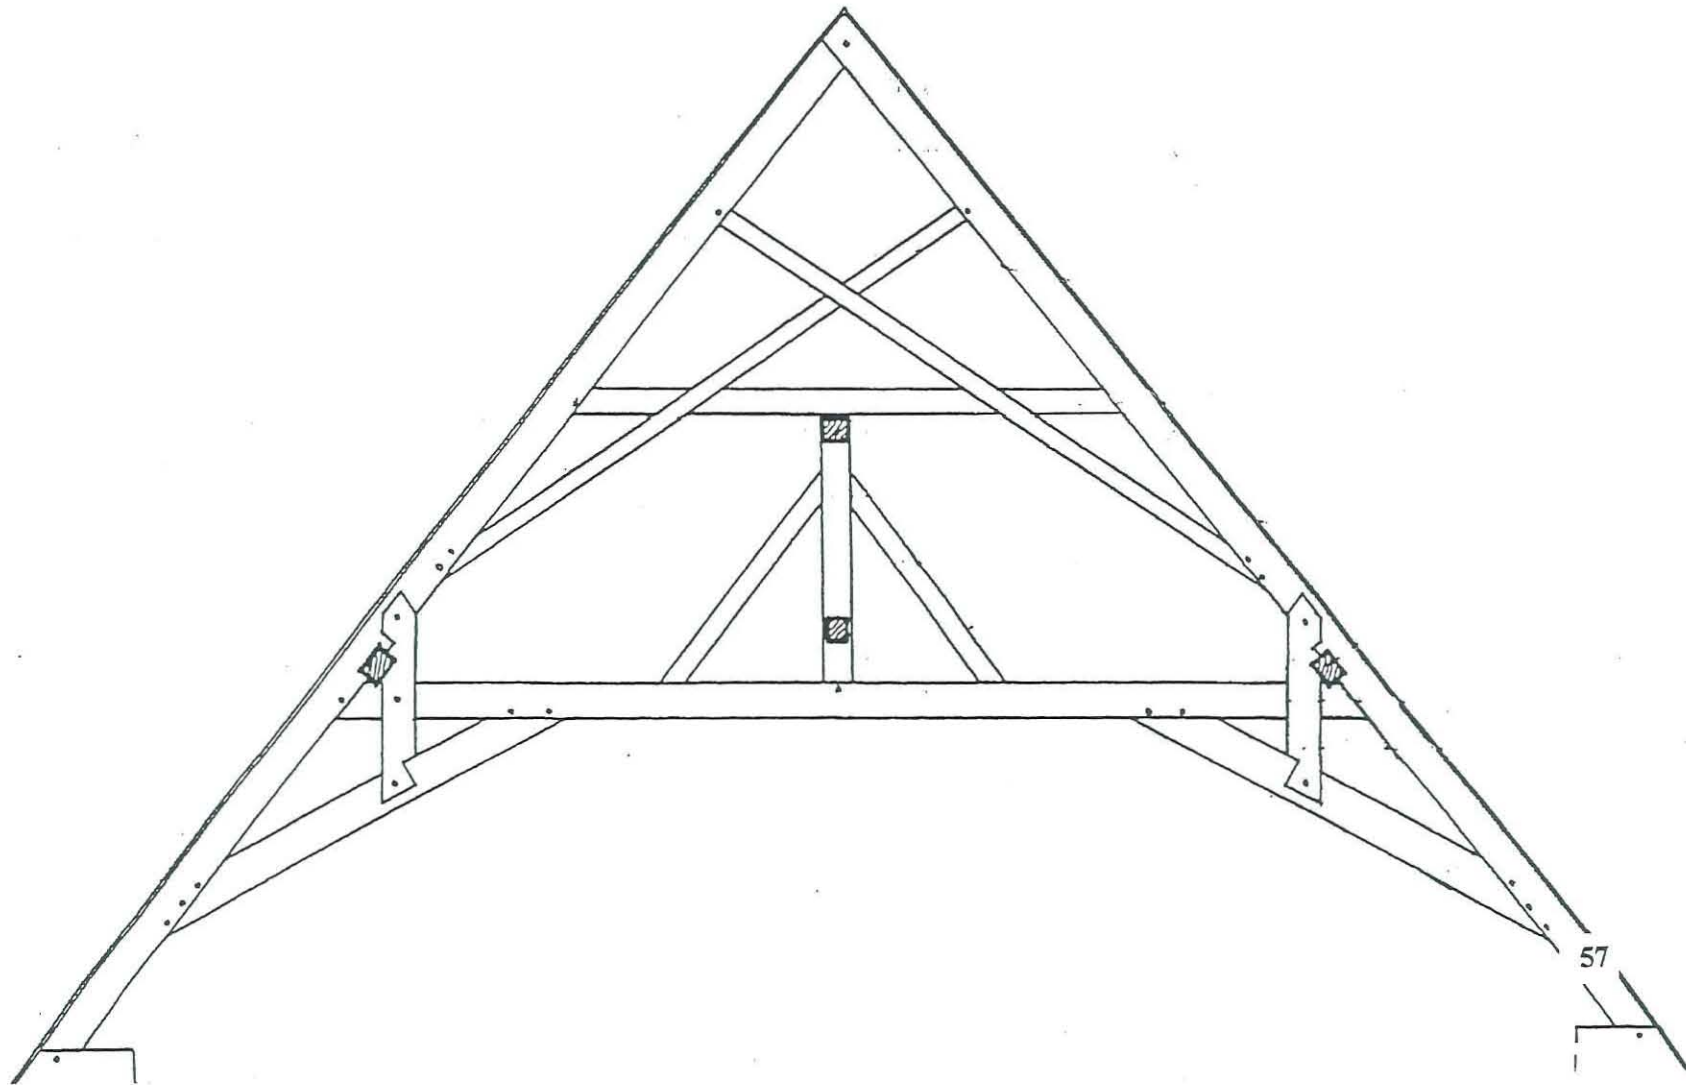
Drawing of frame 49 of the Choir and crossing, viewed from the east, to show sample locations
